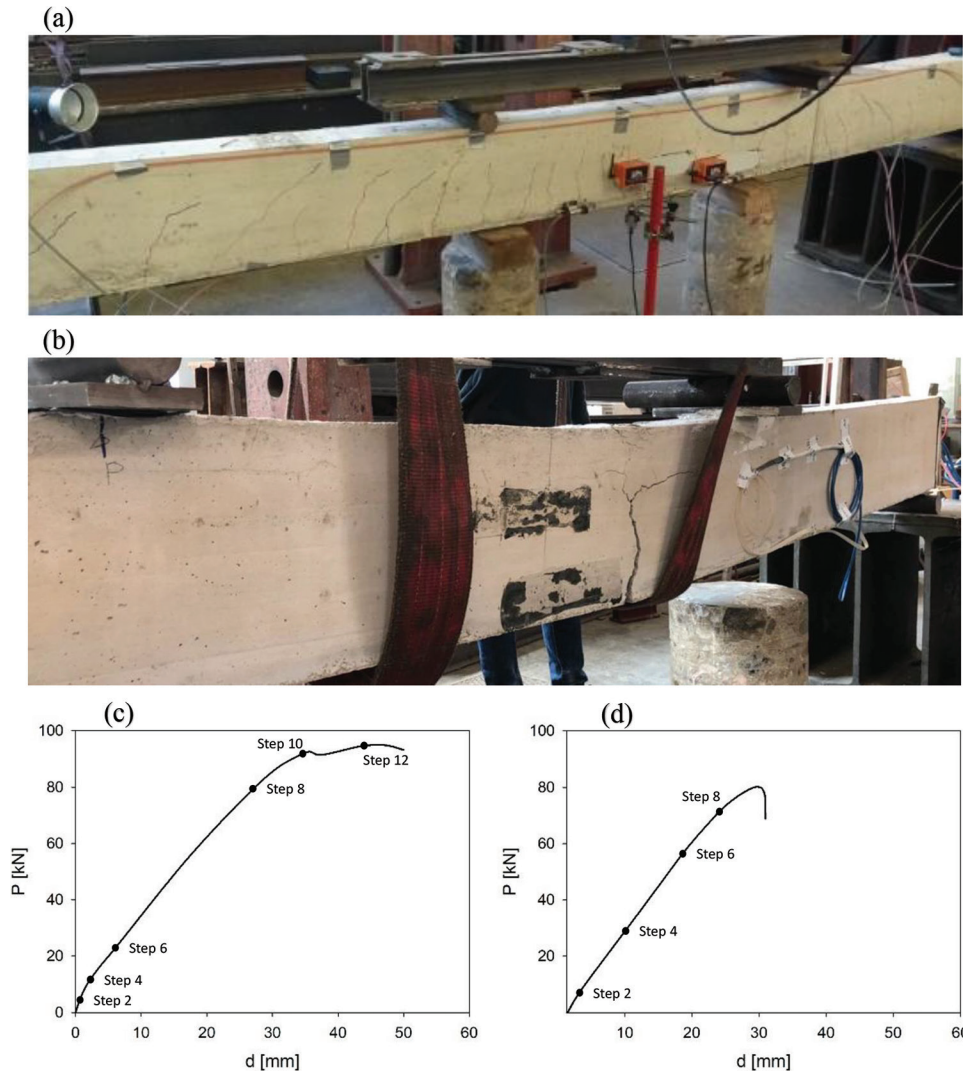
(a) Crack path of Beam 1 at end of test, before collapse; (b) crack path of Beam 2 at collapse; force-displacement diagrams for (c) Beam 1; and (d) Beam 2.
